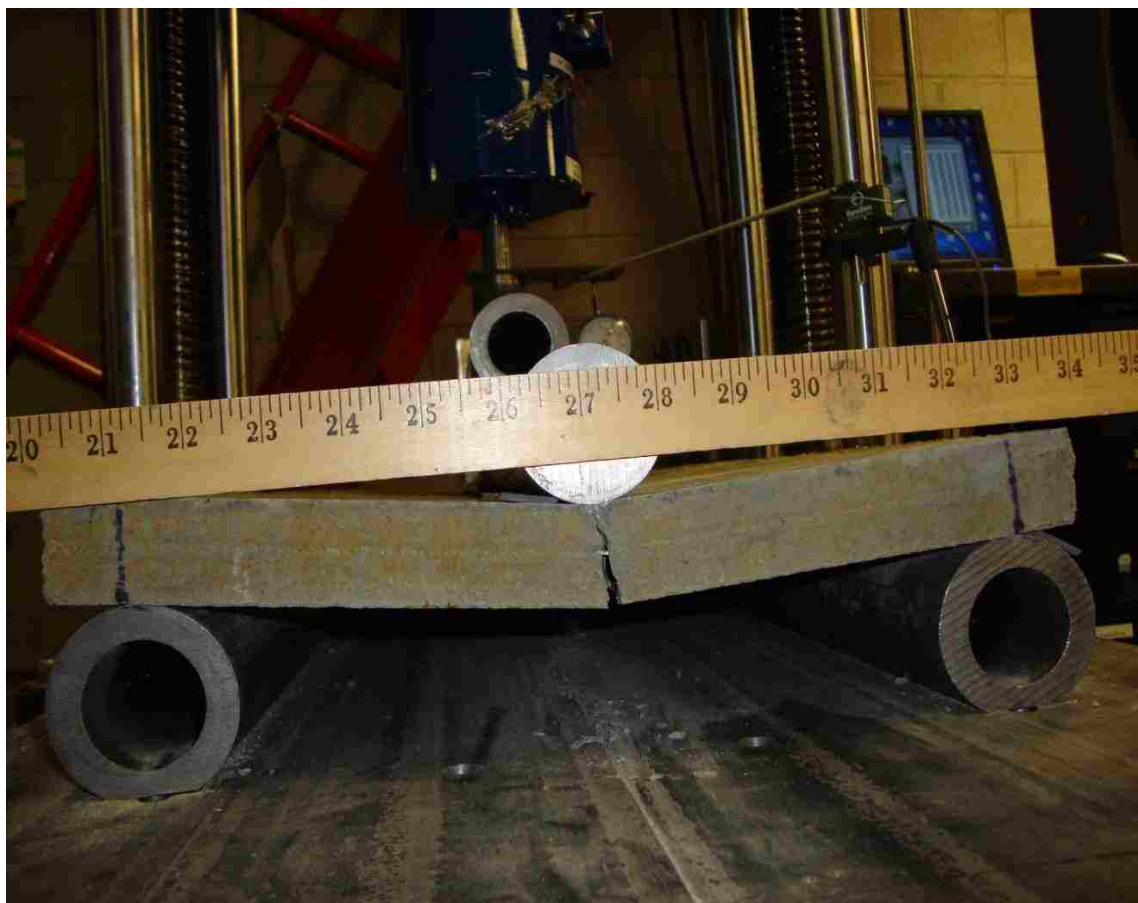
Failure patterns for short span 2% HSSFRC rectangular plates under longitudinal line load
